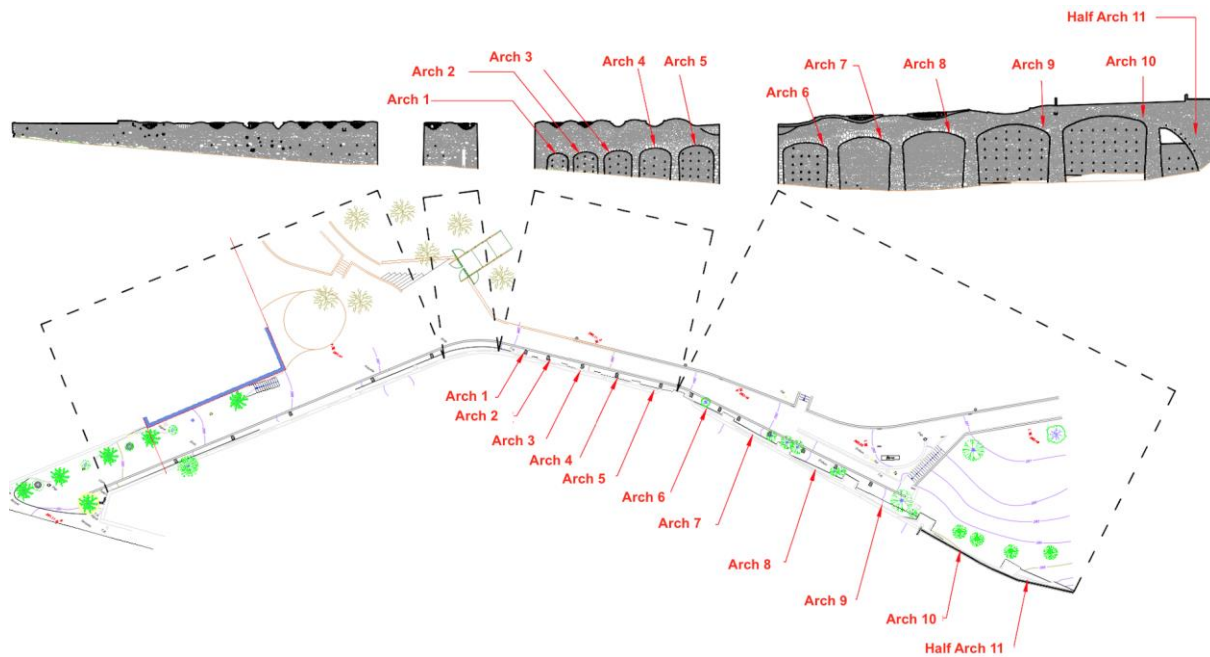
Elevation drawing of the front surface and plan view of the wall of Casa Salvans.
